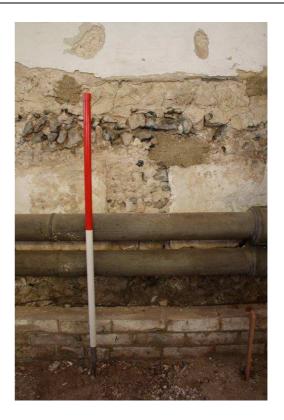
South aisle, pew scar 5, looking south, scale 1x1m.
